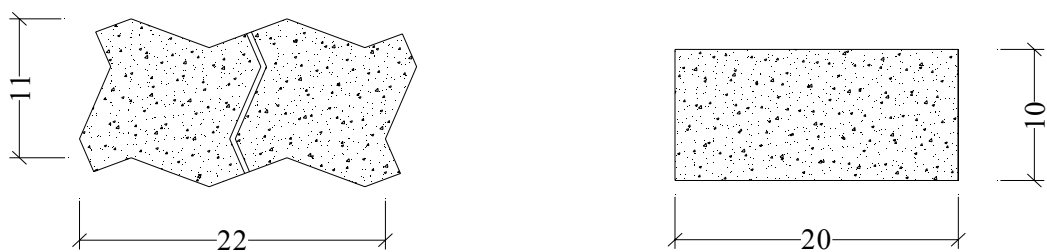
Details of Concrete Blocks (dimensions in cm)
